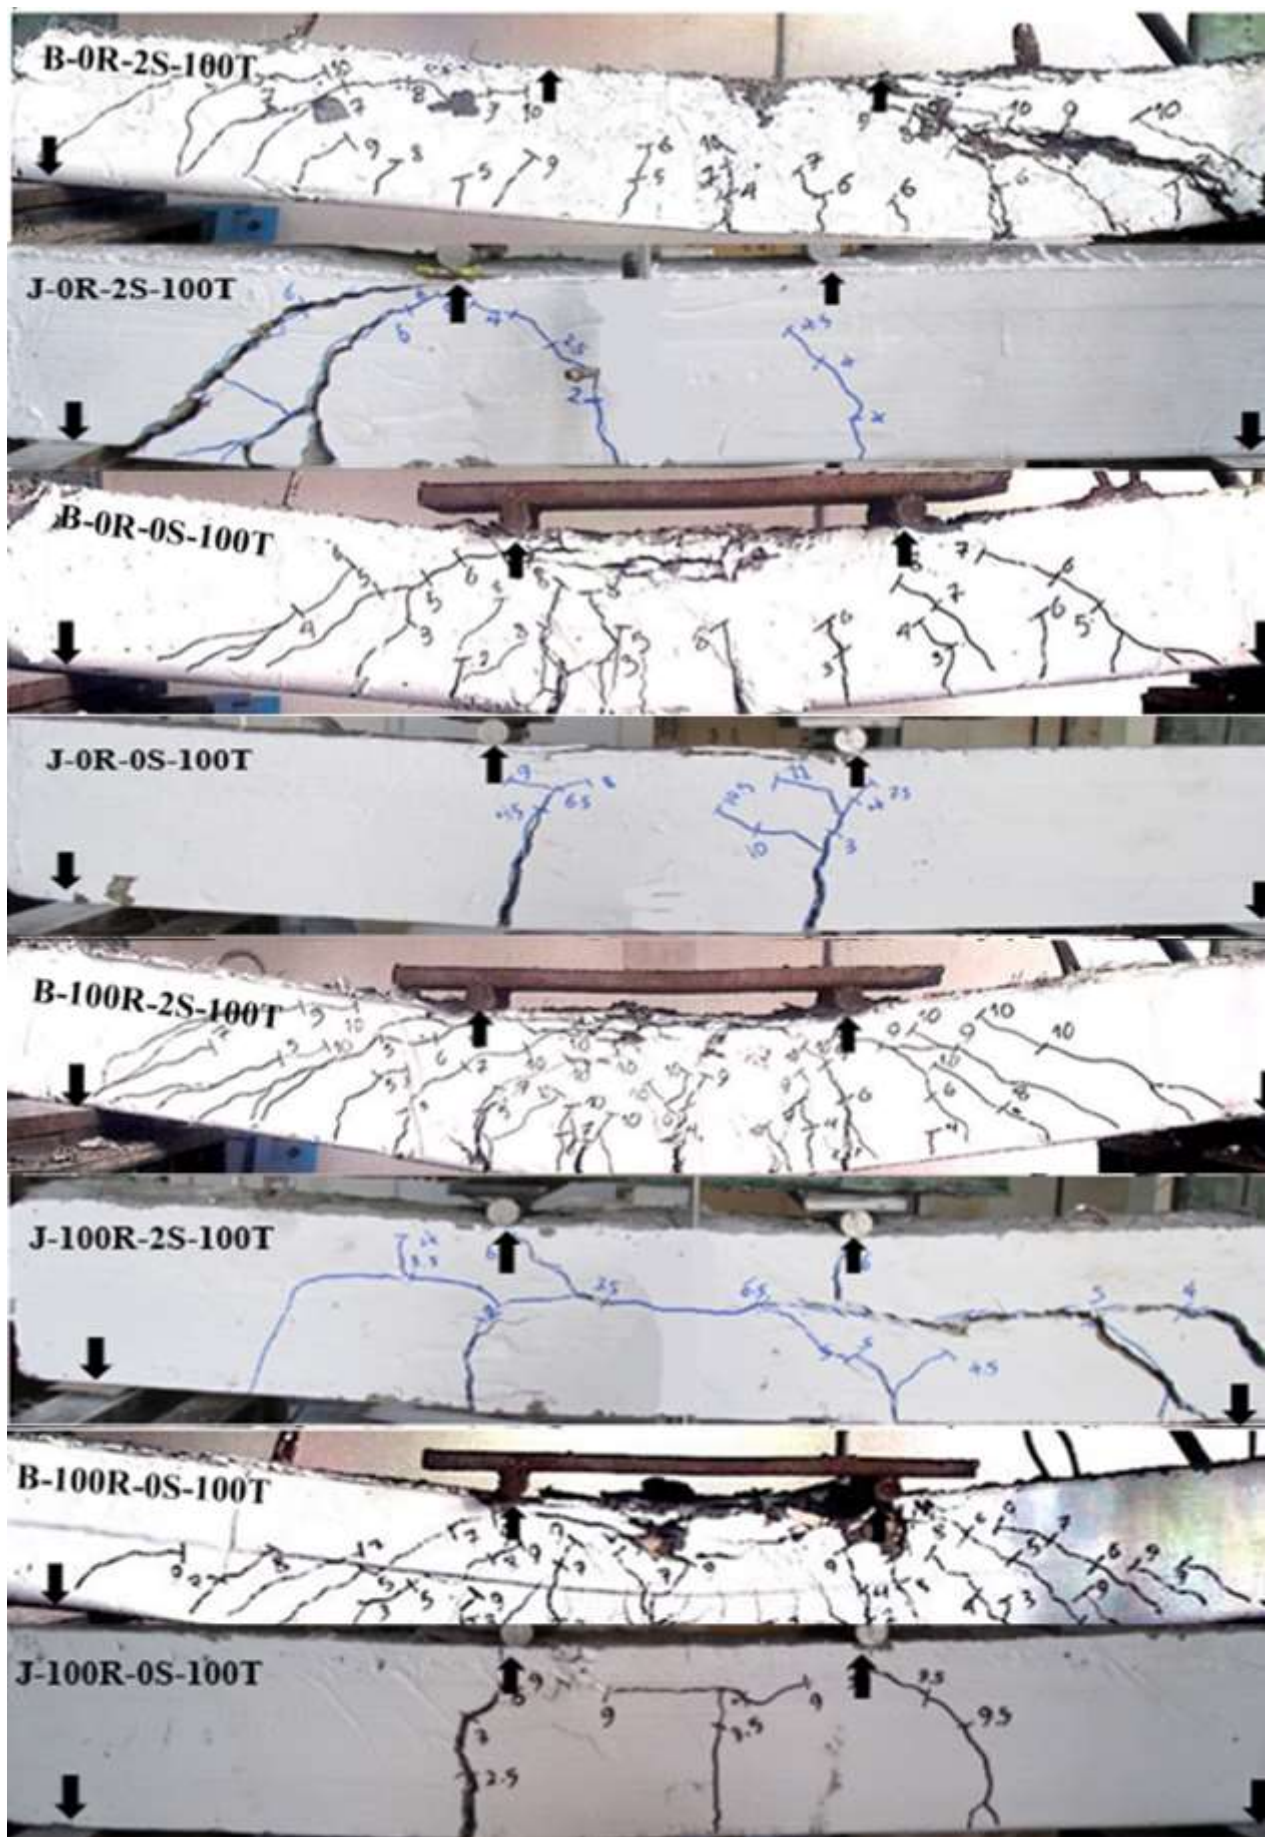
Failure in specimens with TR spaced 100 mm and cracks propagation during loading
